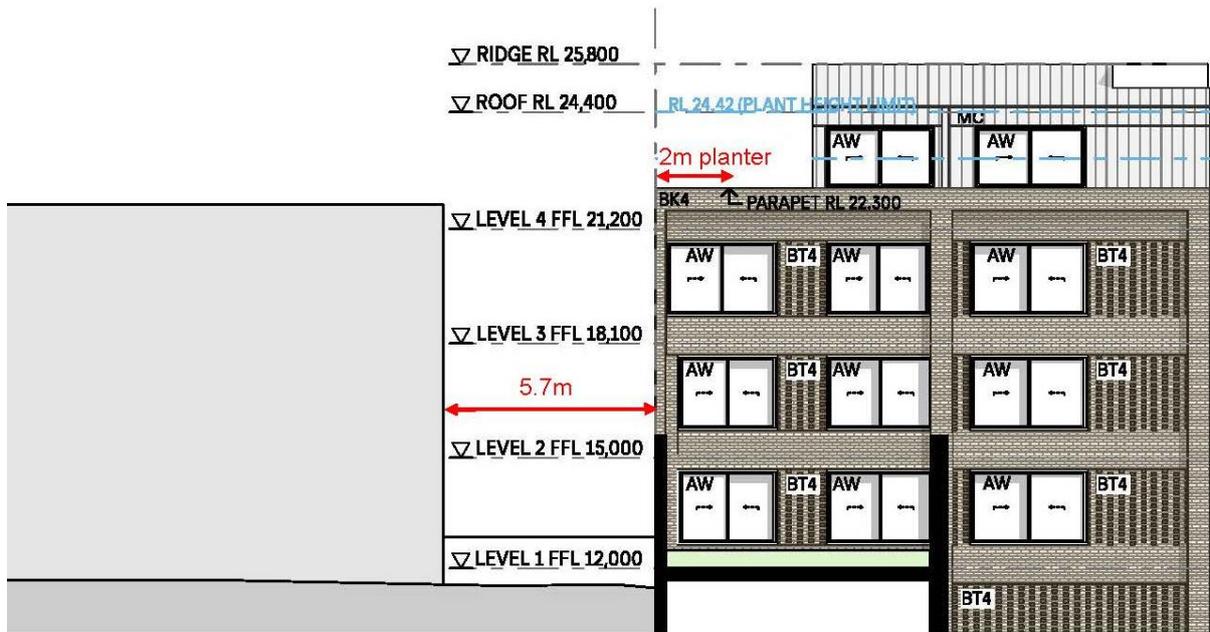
Courtyard section illustrating height of adjacent building at 118-136 Lawrence Street
